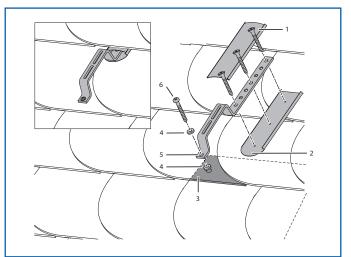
Special roof jack with waterproof cover (optional) for attaching a rooftop installation kit for flat-plate collectors to a slate or shingle roof
